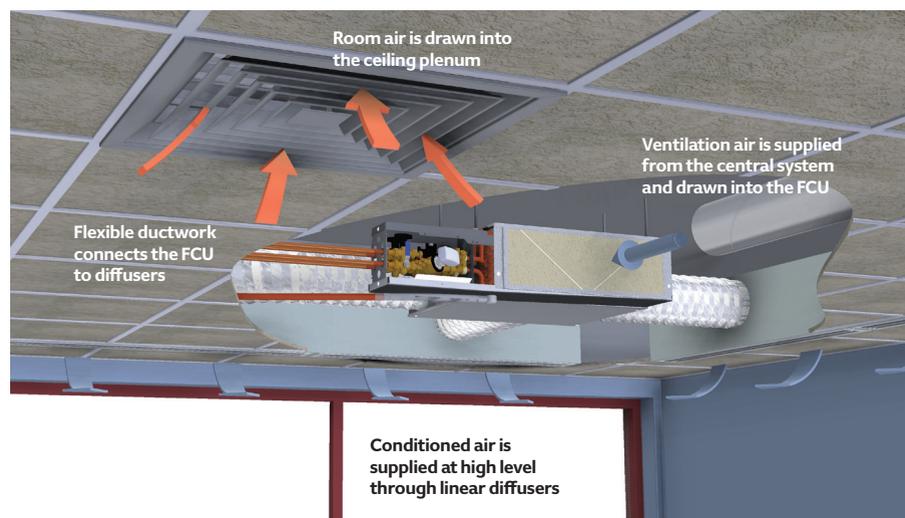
Example of fan coil unit installed in ceiling void, supplying linear diffusers and drawing room air through ceiling plenum, as well as ventilation air from a centrally supplied system (Source: Ruskin)
